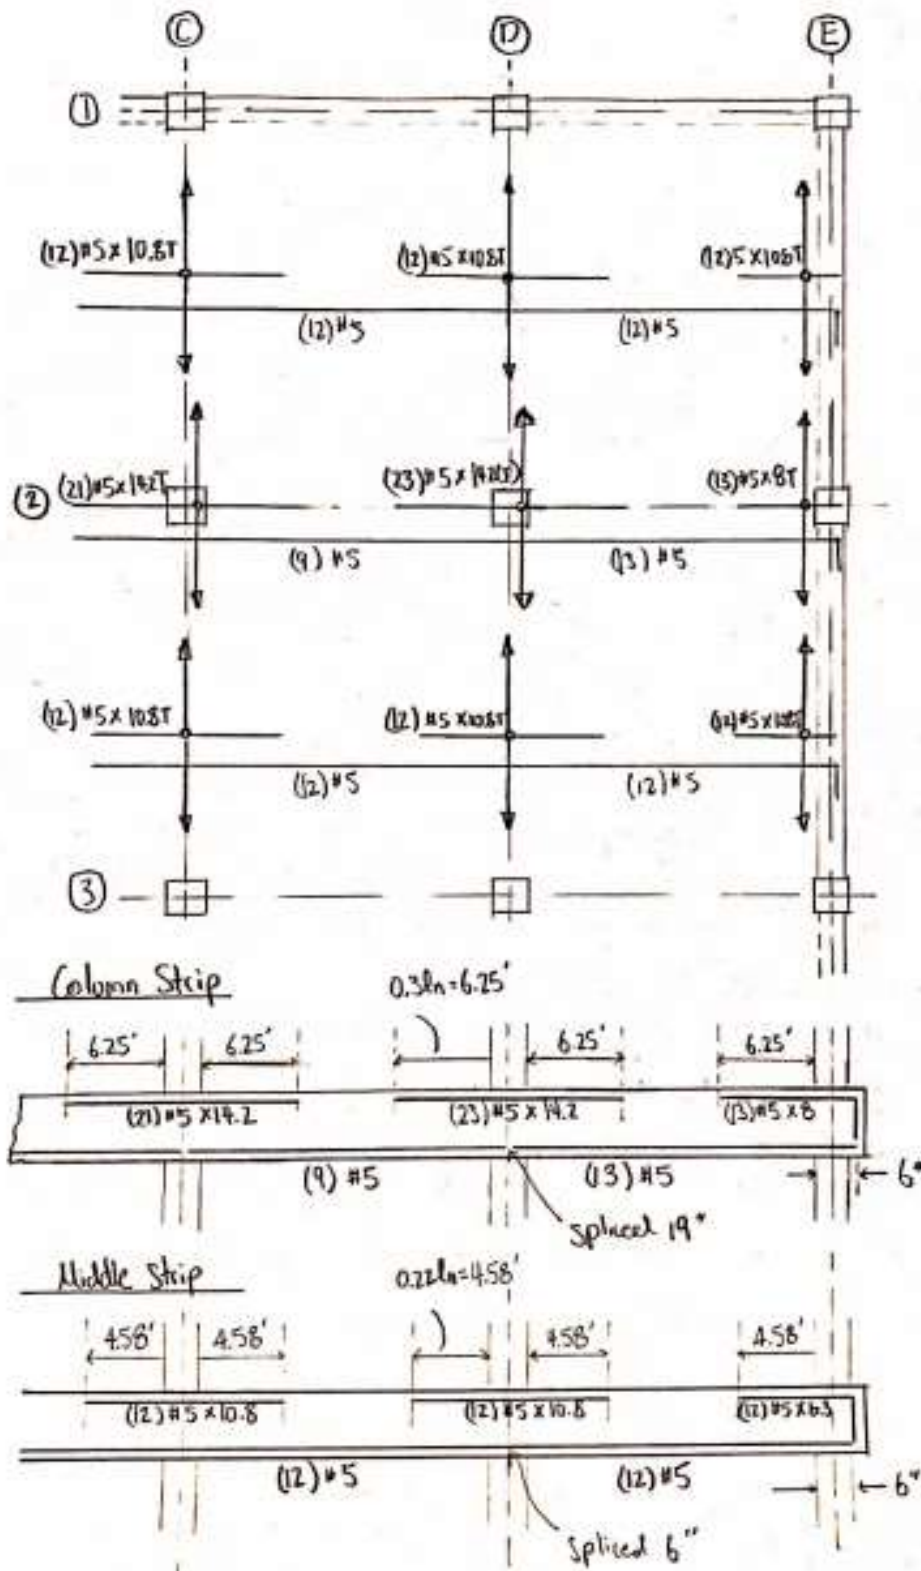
Flexural Reinforcement Placement and detailing (DDM)
